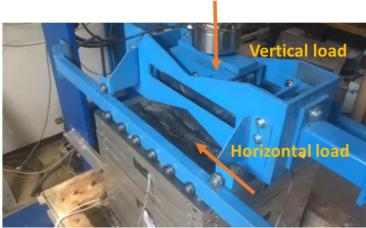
Pavement structure loaded by traffic load (simultaneous vertical and horizontal loading)
